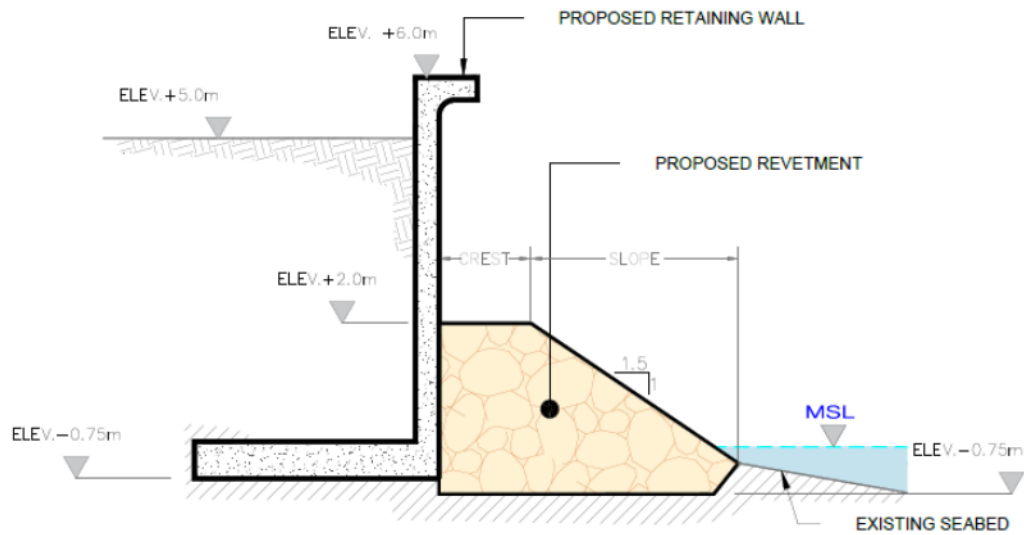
Typical cross-section for revetment and seawall for peninsula
